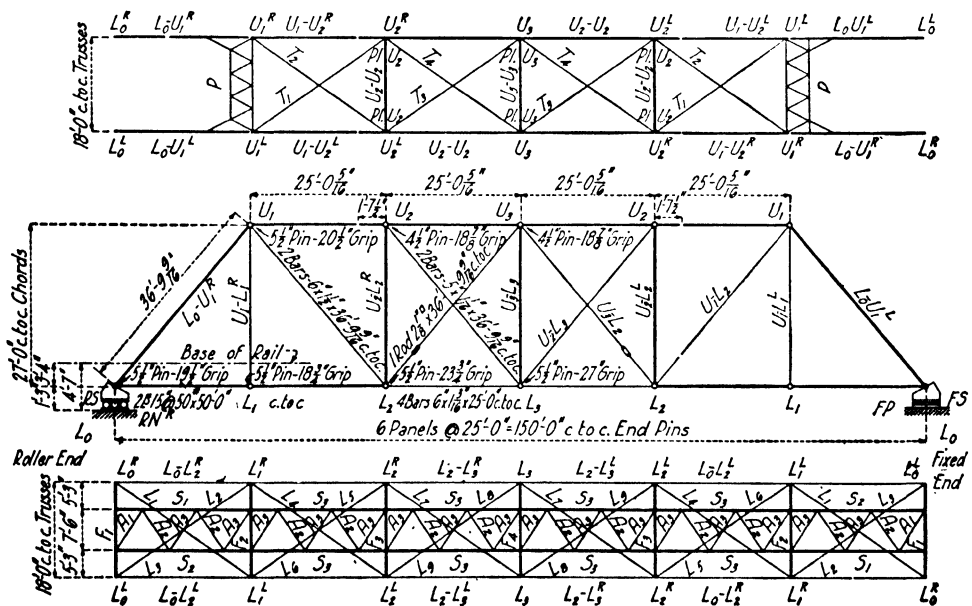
MARKING DIAGRAM FOR TRUSS BRIDGE.
